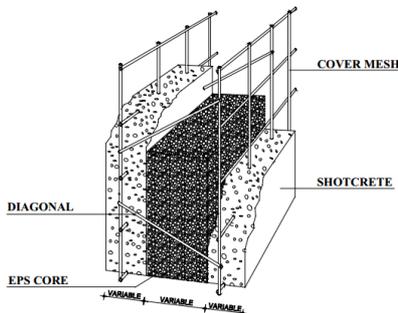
EVG 3D construction system used in the prototype house. (Source: www.evg.com)
